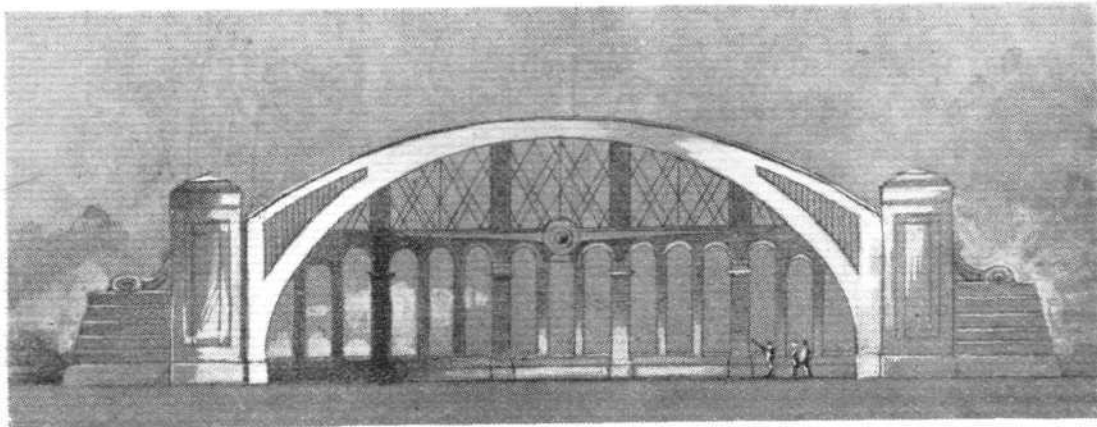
Elevation of the Hangar shown in Fig. 9.
